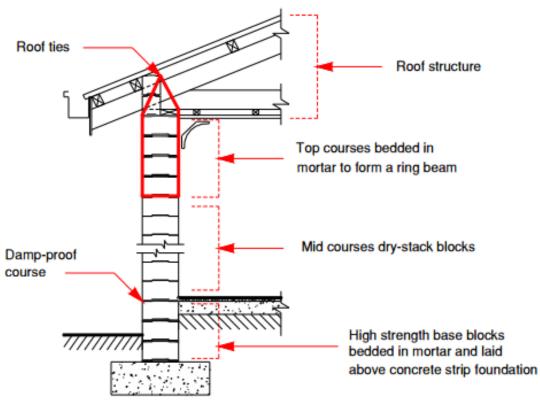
Typical construction detail of Hydraform dry-stack system
